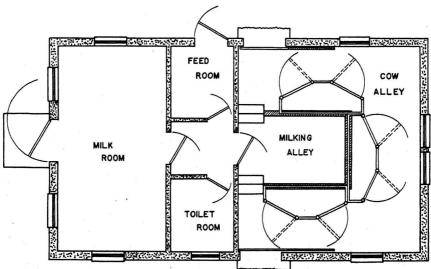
U-shaped Arrangement, Elevated-Platform Milking Barn and Milk House Combination (Mo. Plan No. 18-723-C1).
